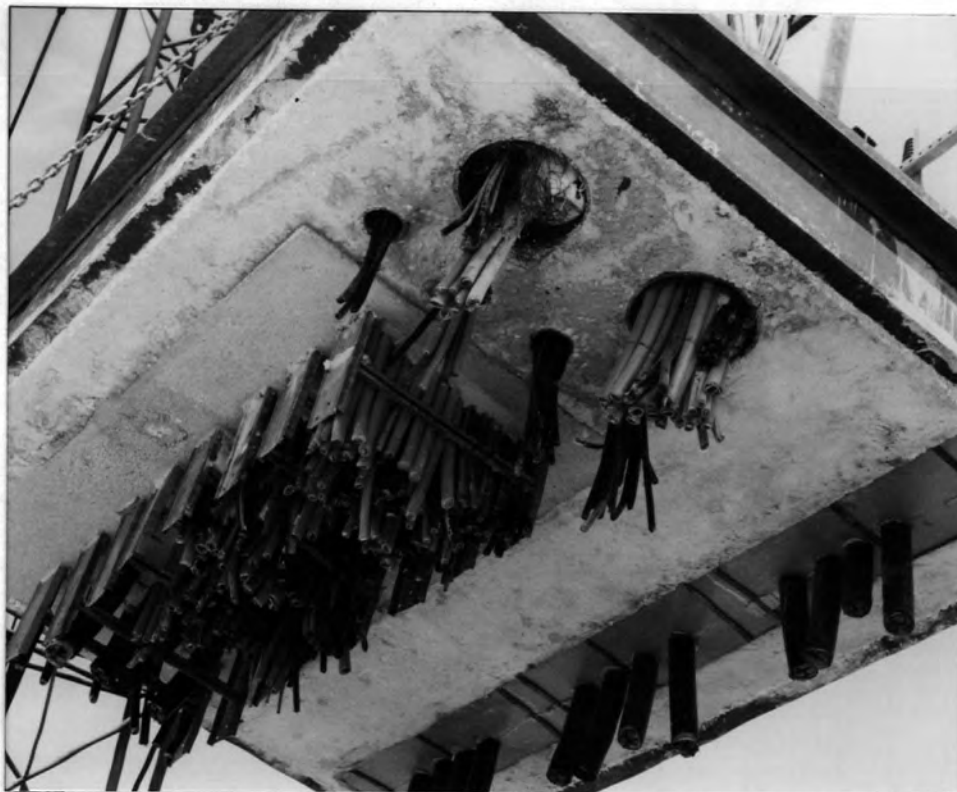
OVERALL VIEW OF TEST SLAB EXPOSED SIDE
